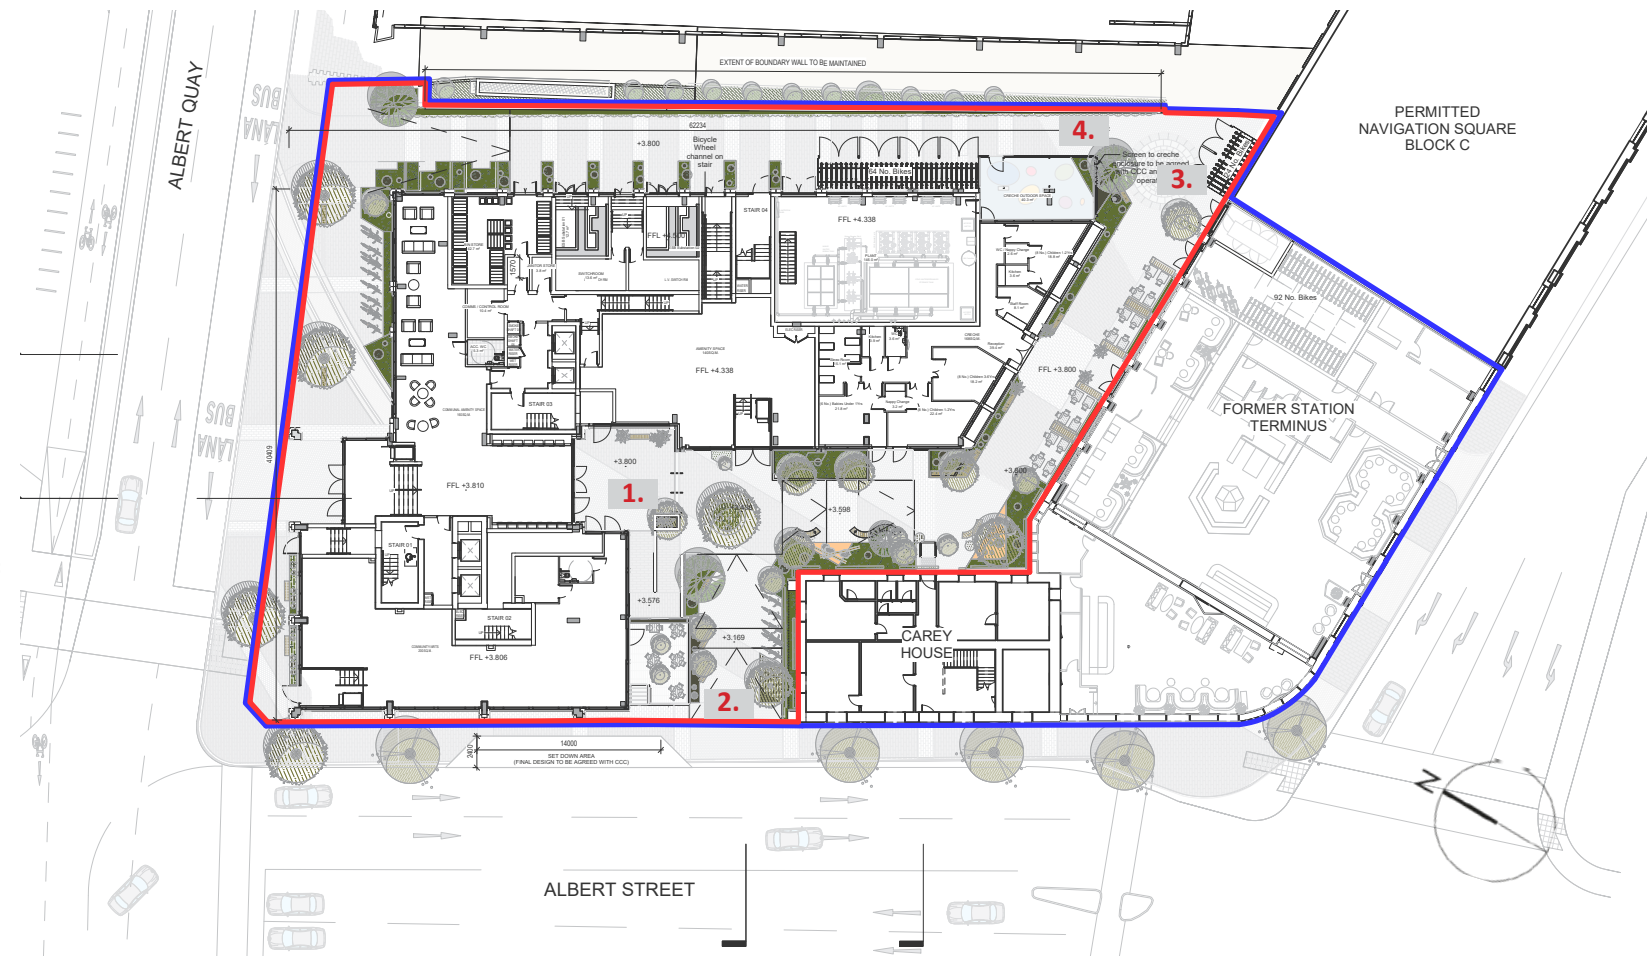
Ground Floor External Amenity Plan - Public Plaza
